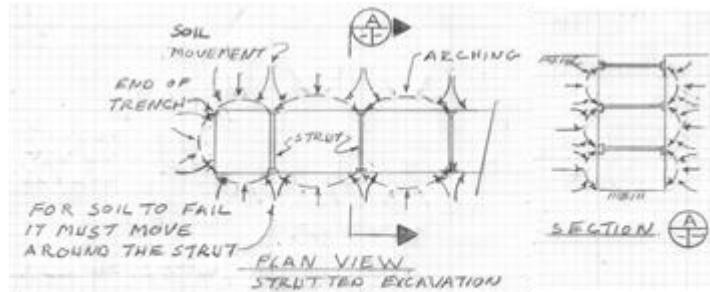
Soil arching between strutting or hydraulic shores, and also to end of trench or
